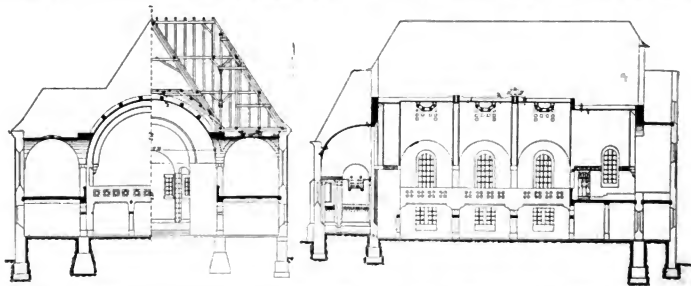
LONGITUDINAL AND TRANSVERSE SECTION OF CHURCH AT STEBEN, BAVARIA.
